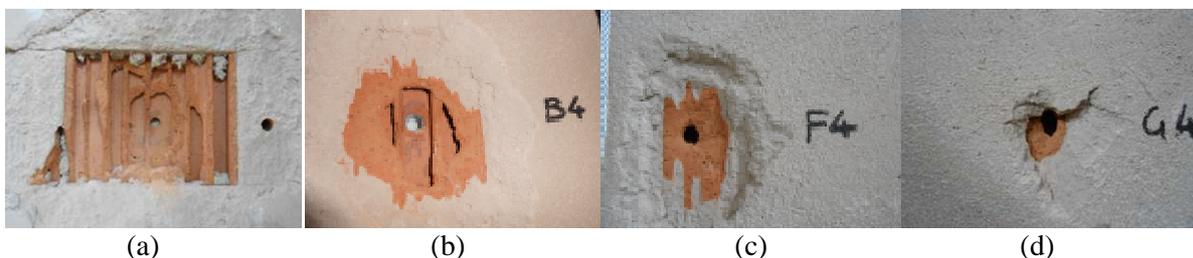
Failure modes on masonry infill walls: Chemical anchor (a, b); plastic expansion anchor type A (c, d)
